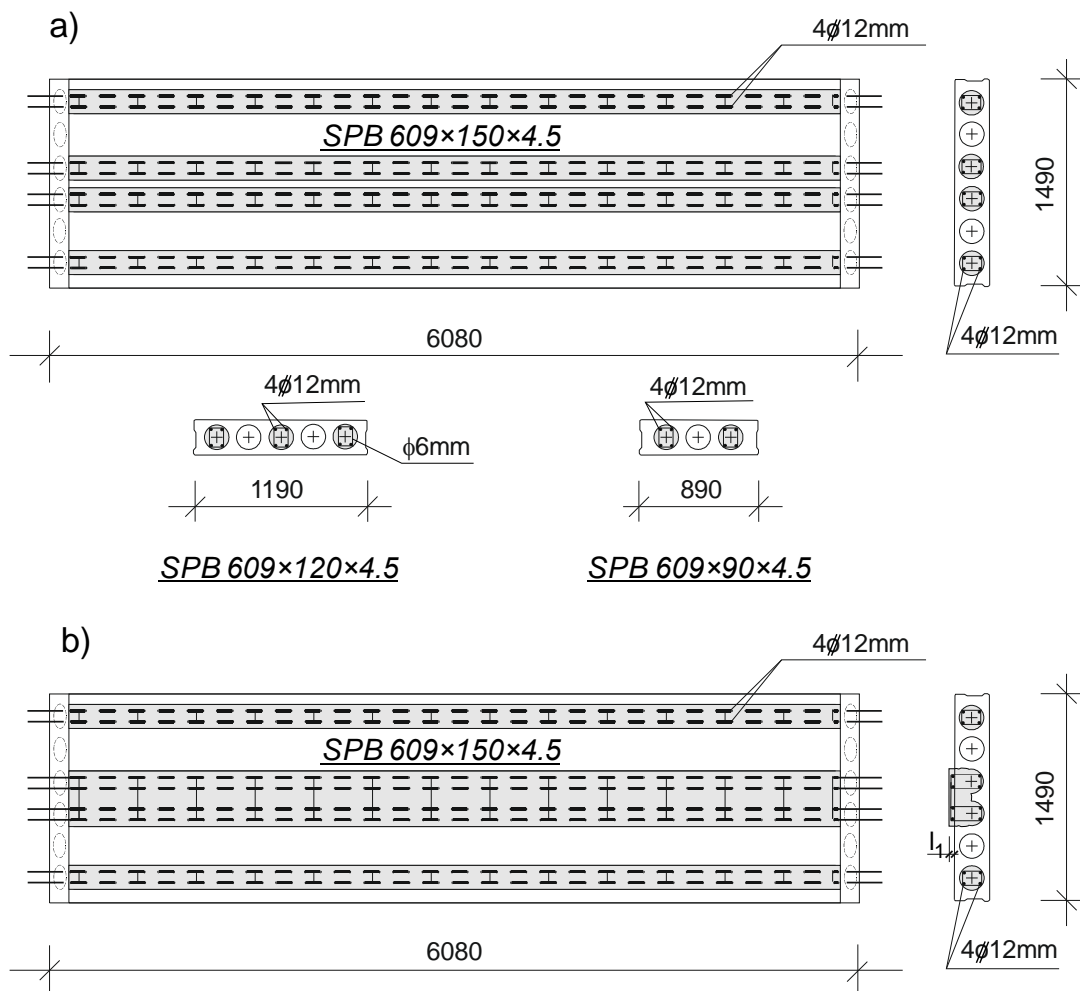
Reinforcement concept for cracked hollow core slabs.
